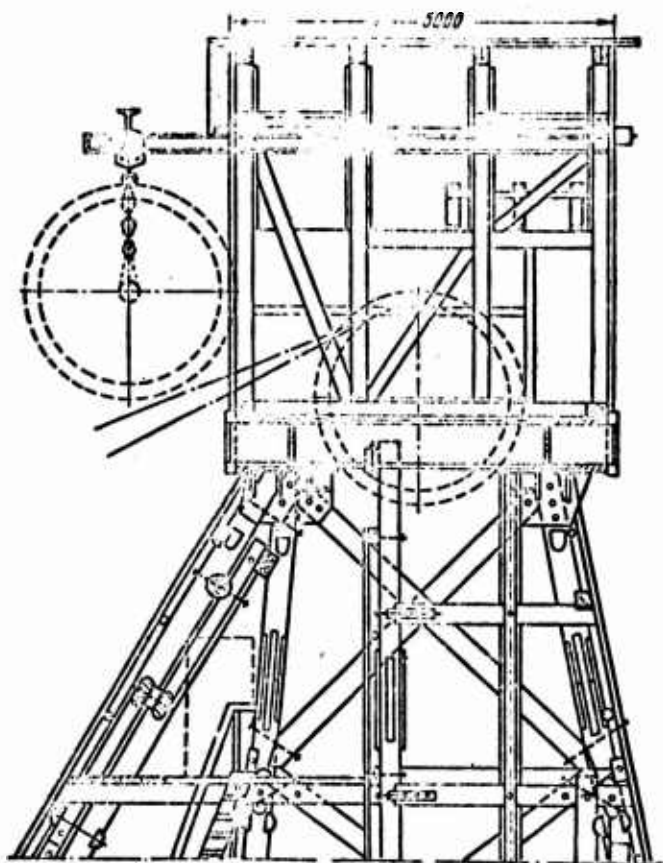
The union of the metallic underground landing with the wooden frames of the pile driver.
